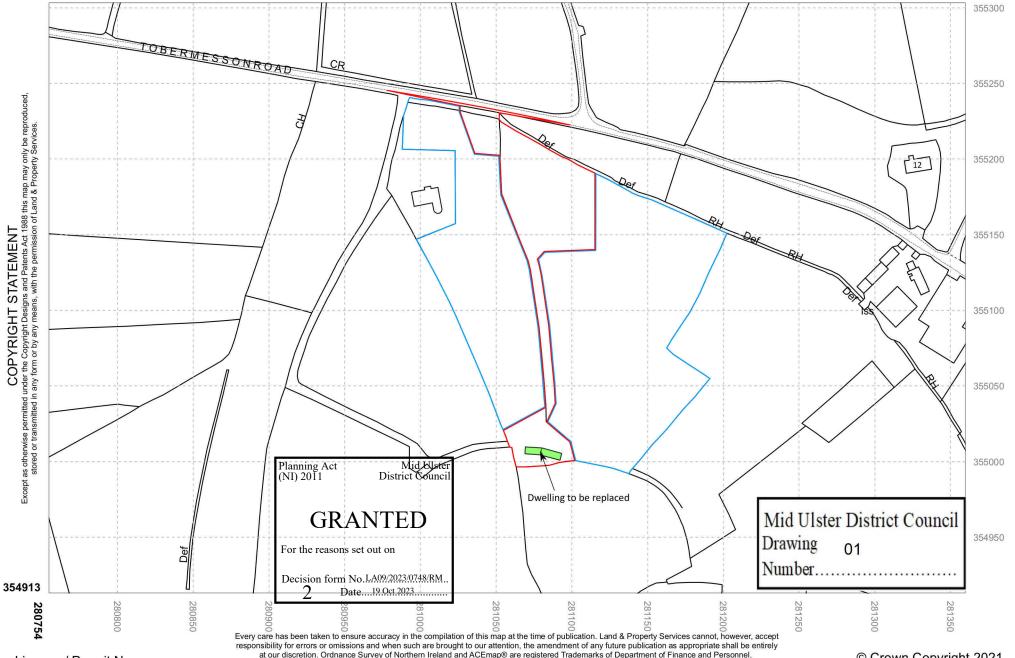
| Site Location Plan | Scale, 1:2500 @ A4
